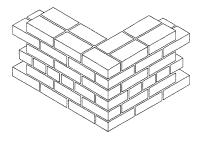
Corner Detail Used in the Construction of S1 and S2.
